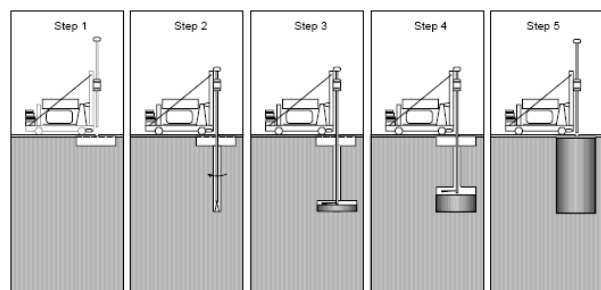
Step-by-step construction of soil cements columns by means of jet grouting technique.
